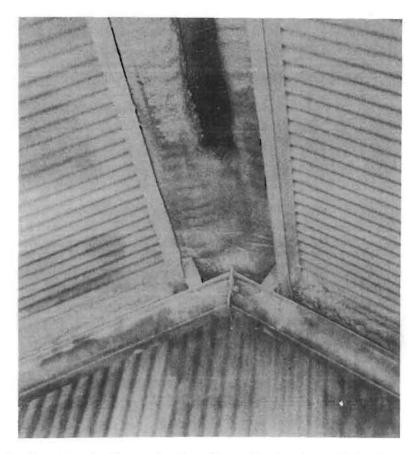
Sealing inside the roof ridge line of a horizontal storage.
